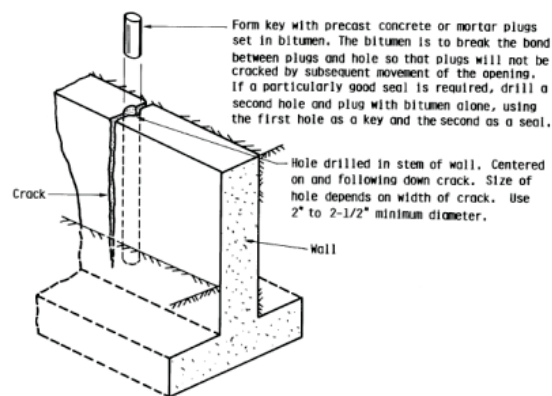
Conceptual sketch for the repairing of cracks using the drill-plug technique
